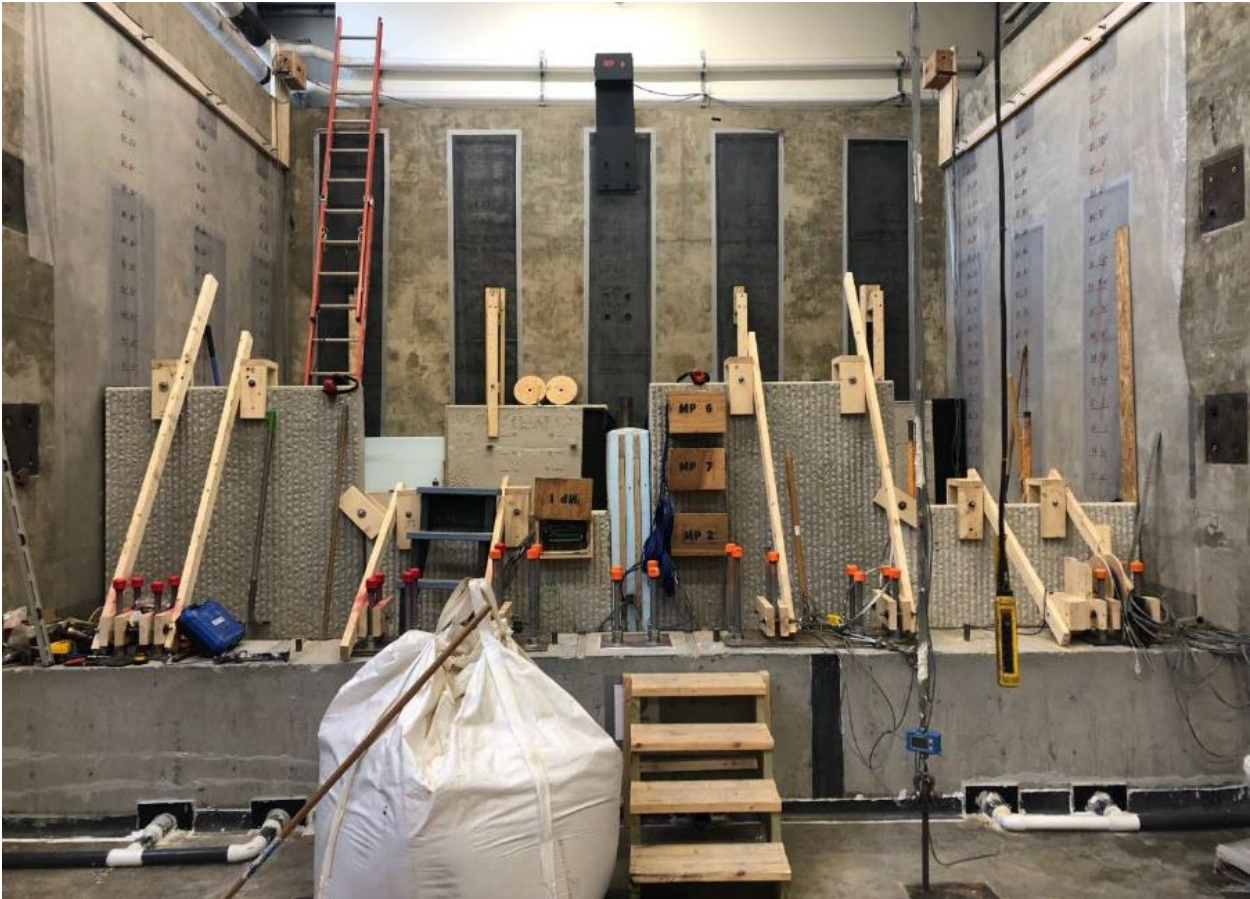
Additional temporary bracing added to control front MSE wall movement.
